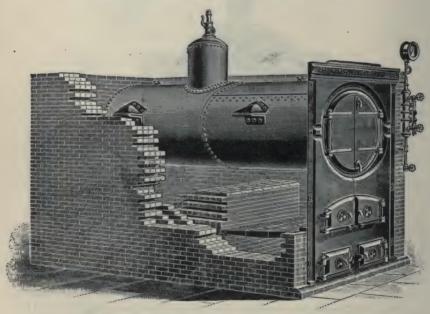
RETURN TUBULAR BOILER WITH SETTING.
